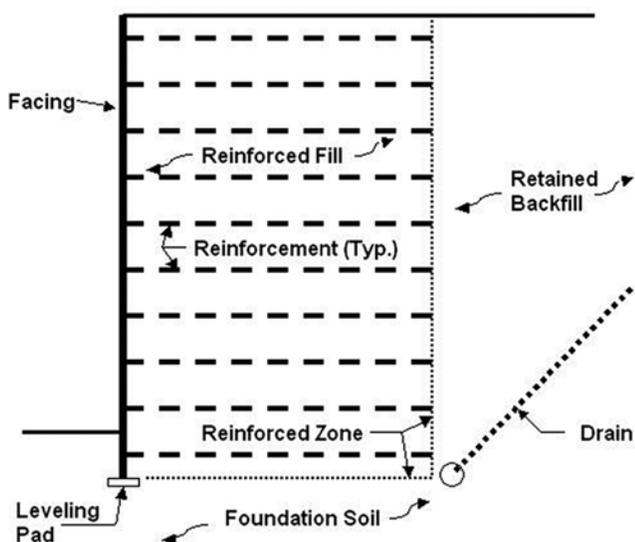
Schematic of a generic mechanically stabilized earth wall (Berg et al. 2009).
